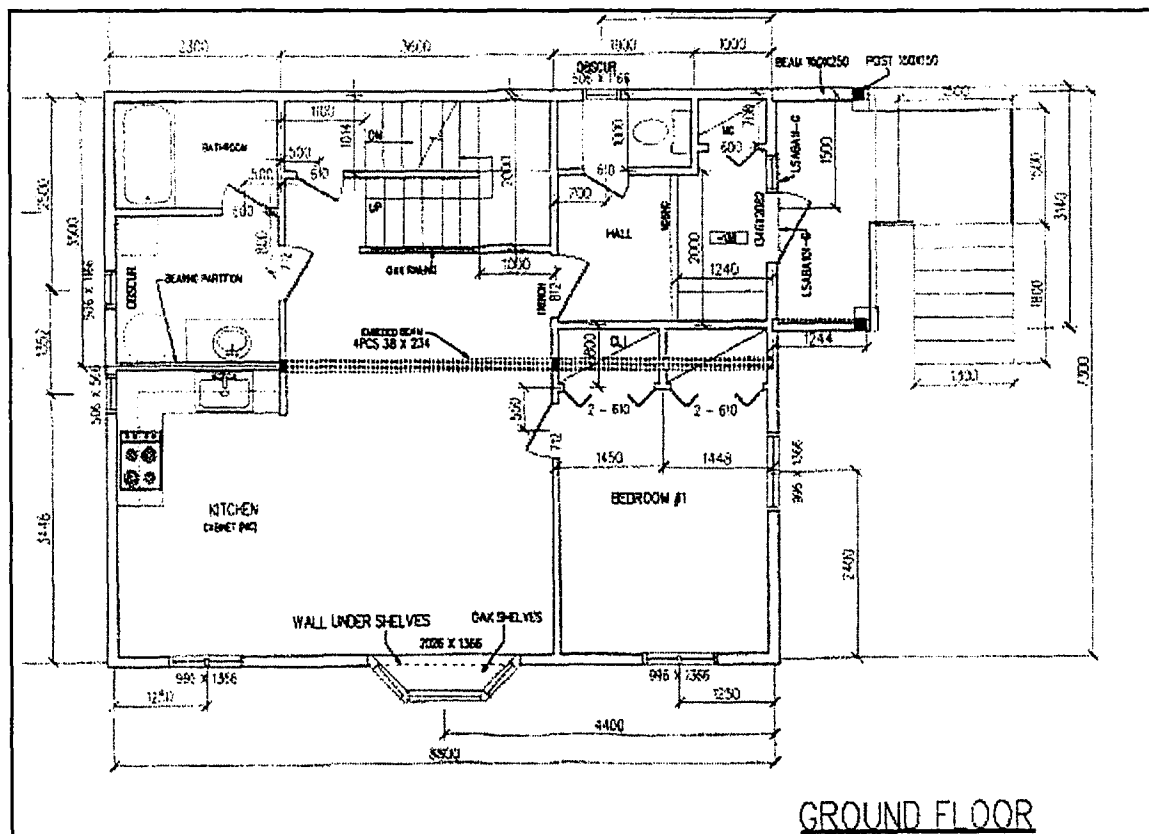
Ground floor plan of house for Japanese client (Modulex Inc., 1996)
